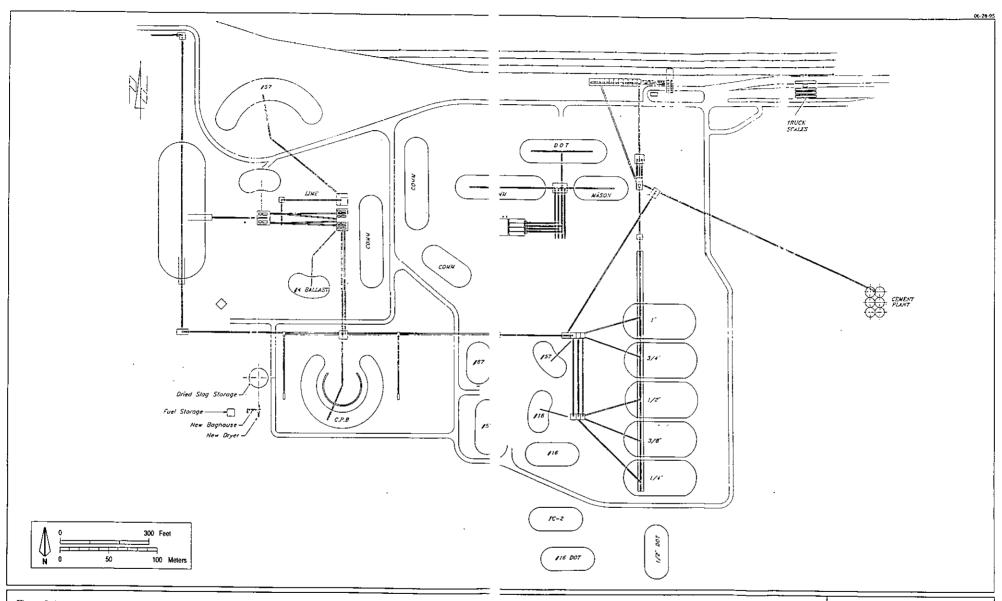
Layout of Slag Dryer and Handling Facilities
